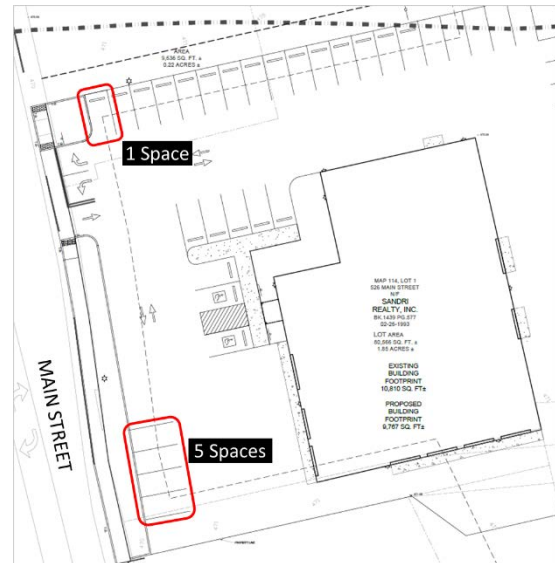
Image from the site plan submitted by the Applicant, with proposed new parking spaces circled in red.
